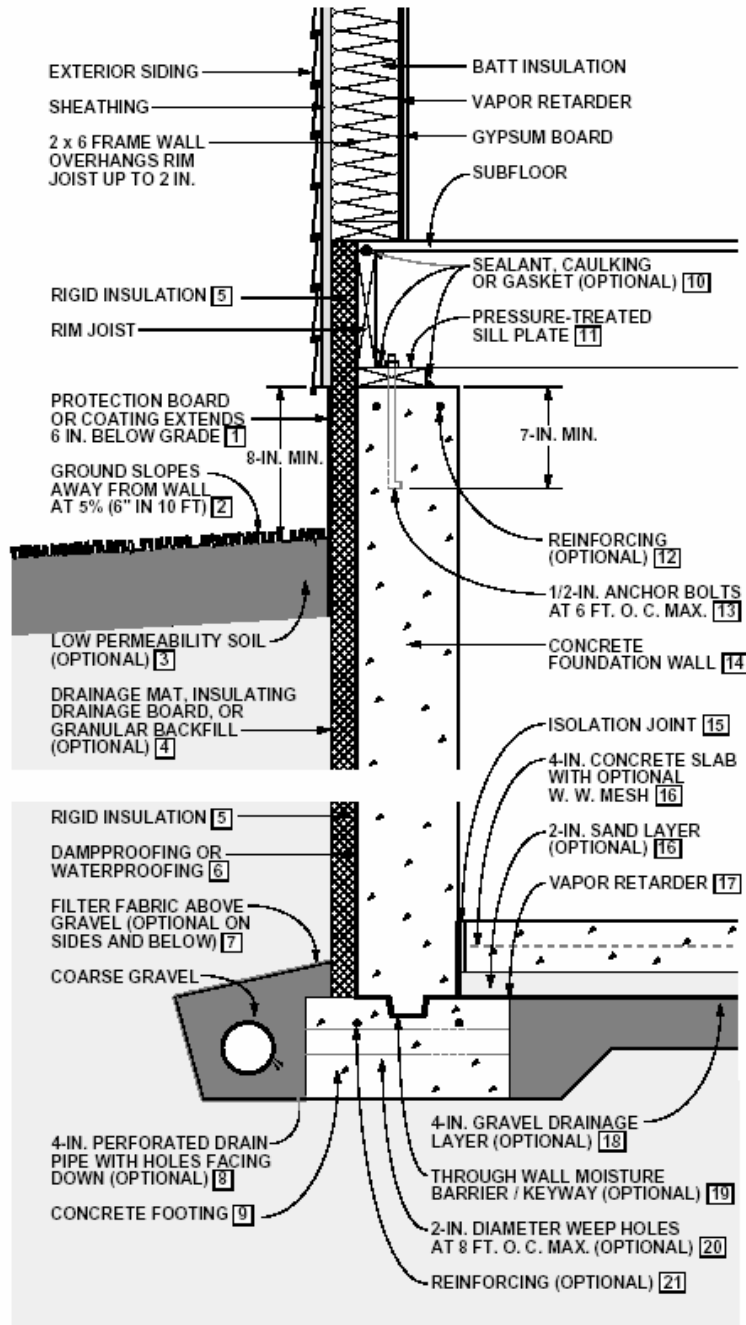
illustrates a concrete foundation wall with exterior insulation. This differs from Figure 2-8 in that the above grade wood frame wall is constructed of 2 x 6's which overhang the foundation wall. The overhang can be up to 2 inches but additional rigid insulation can be added that extends over the entire wall assembly. Another minor difference is that this figure shows a sand layer beneath the floor slab.
